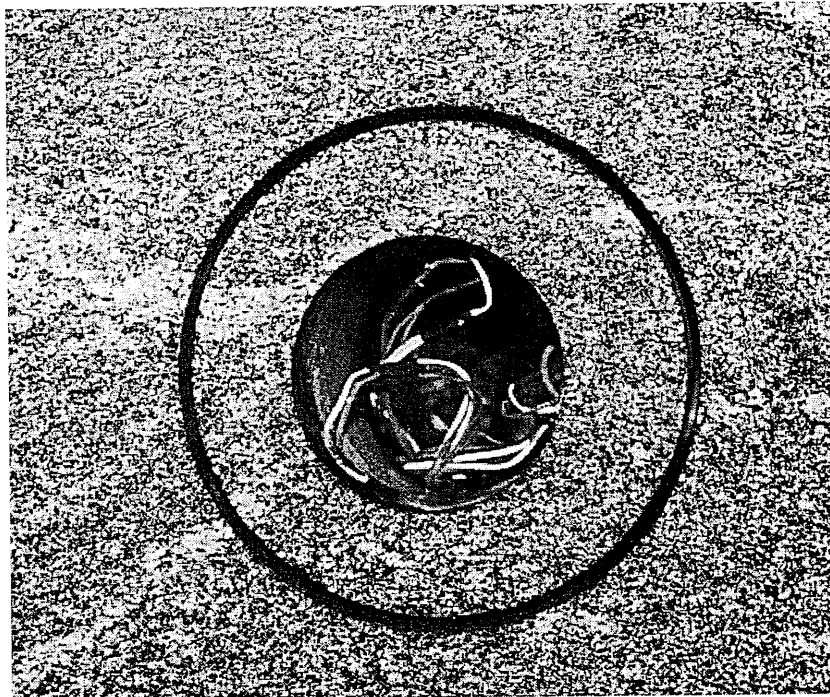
Measurement hole with strain gauges installed after over-coring.
